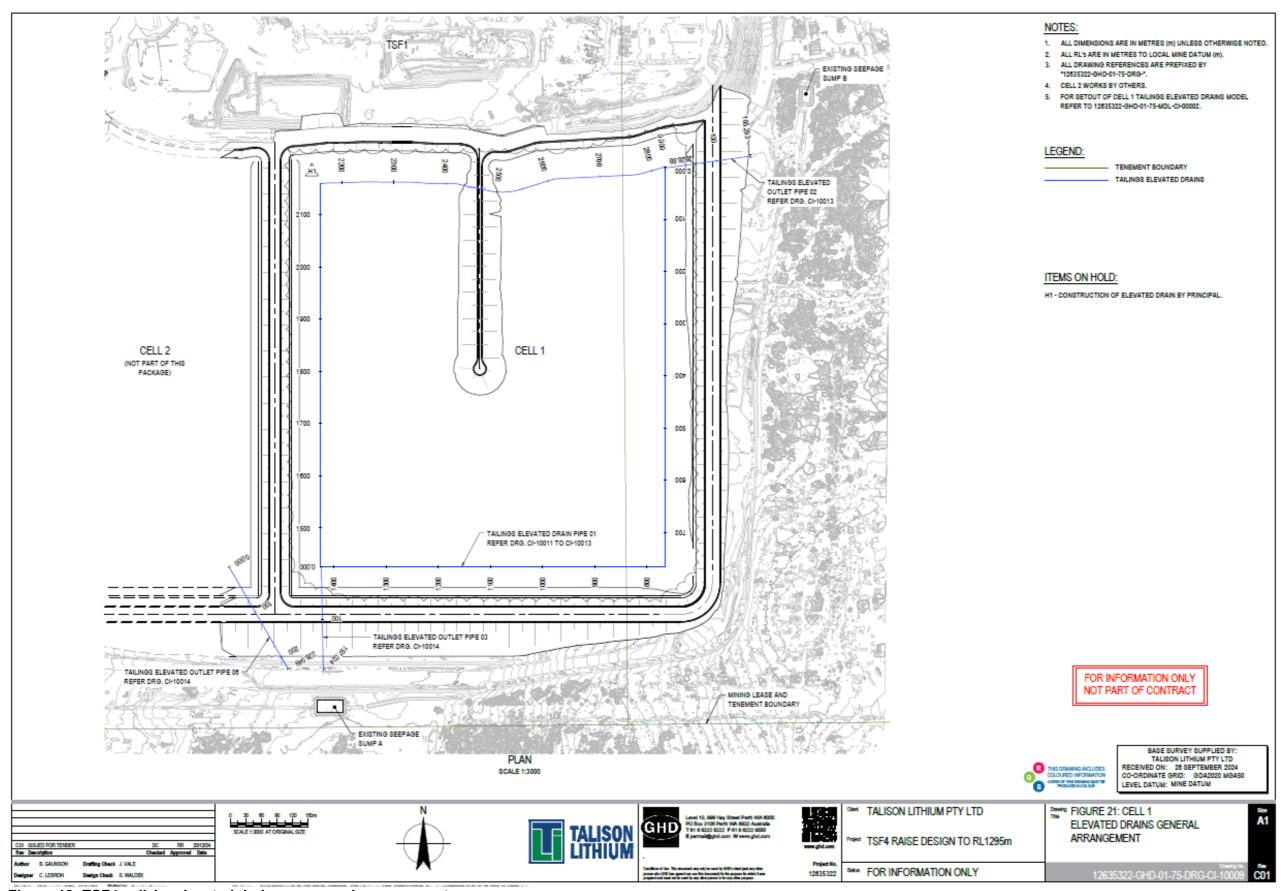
TSF4 cell 1 – elevated drainage general arrangement
